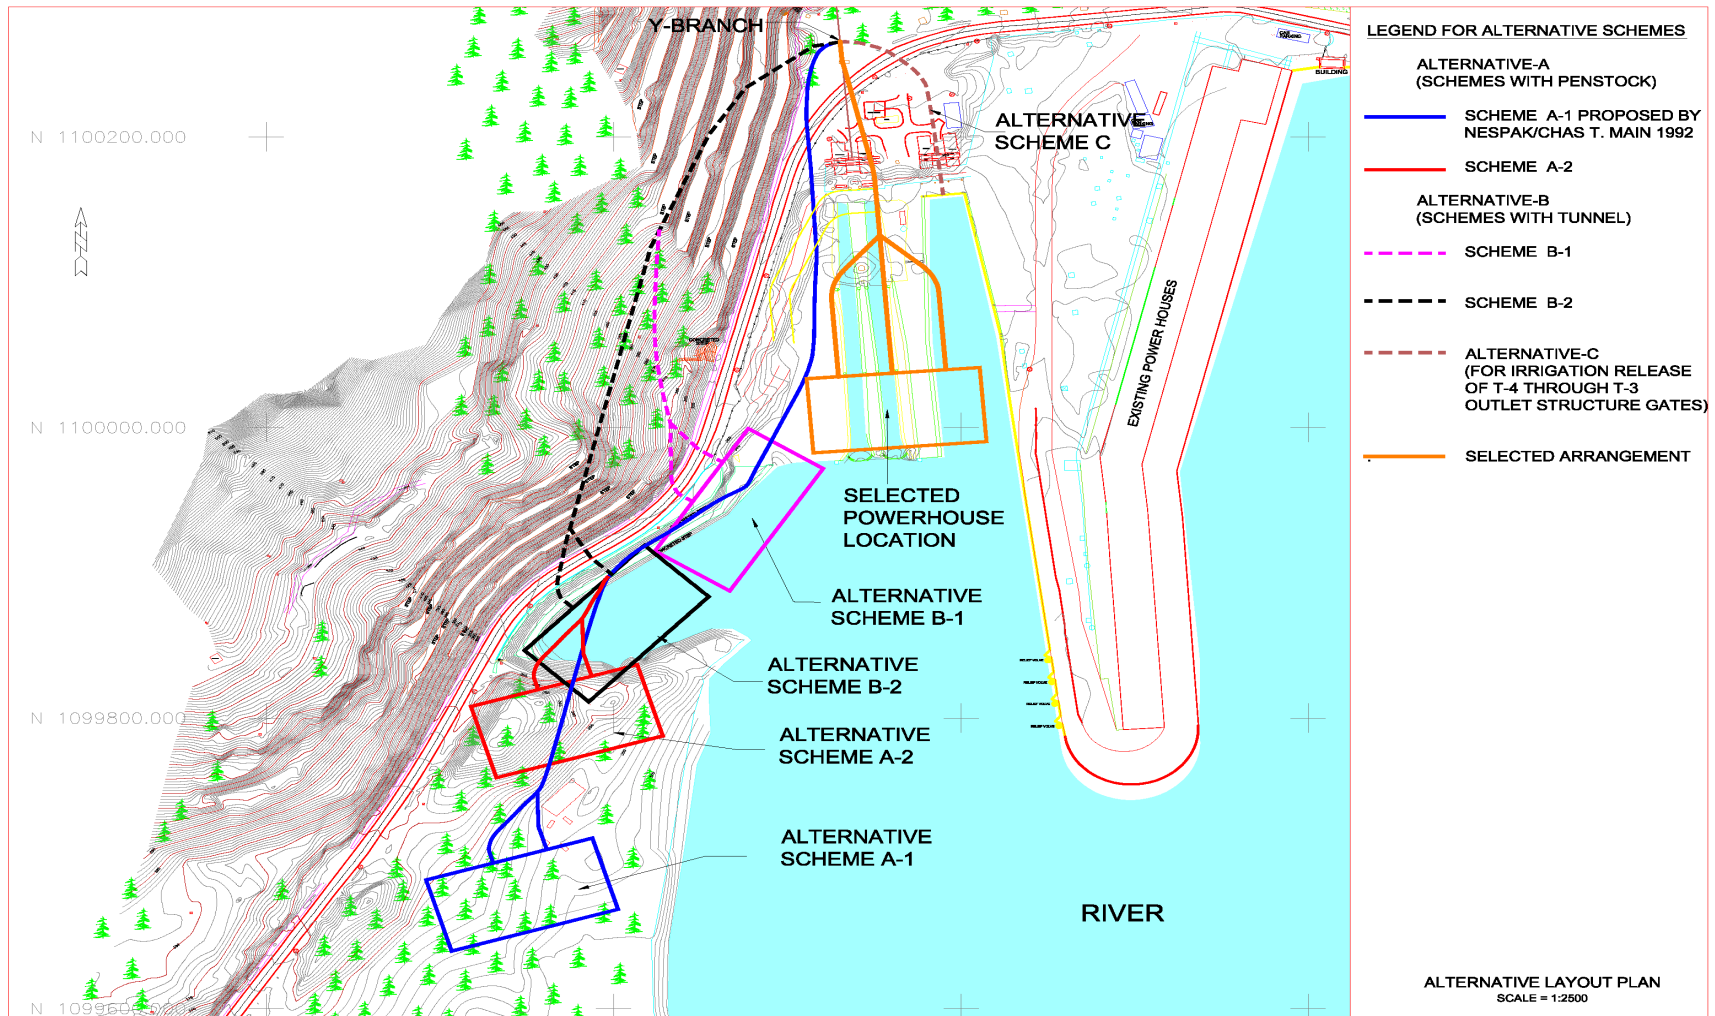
(b): Project Configuration, Alternative Power House Locations
